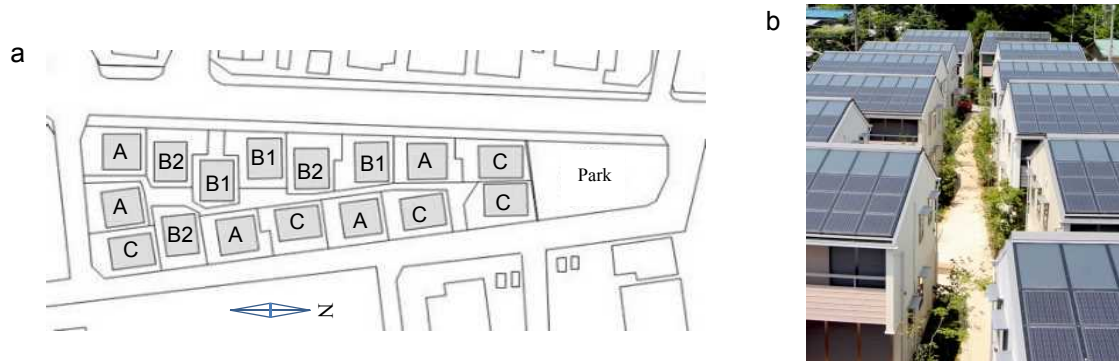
Solar Town Fuchu (a) Site plan and house type; (b) Bird’s-eye view
